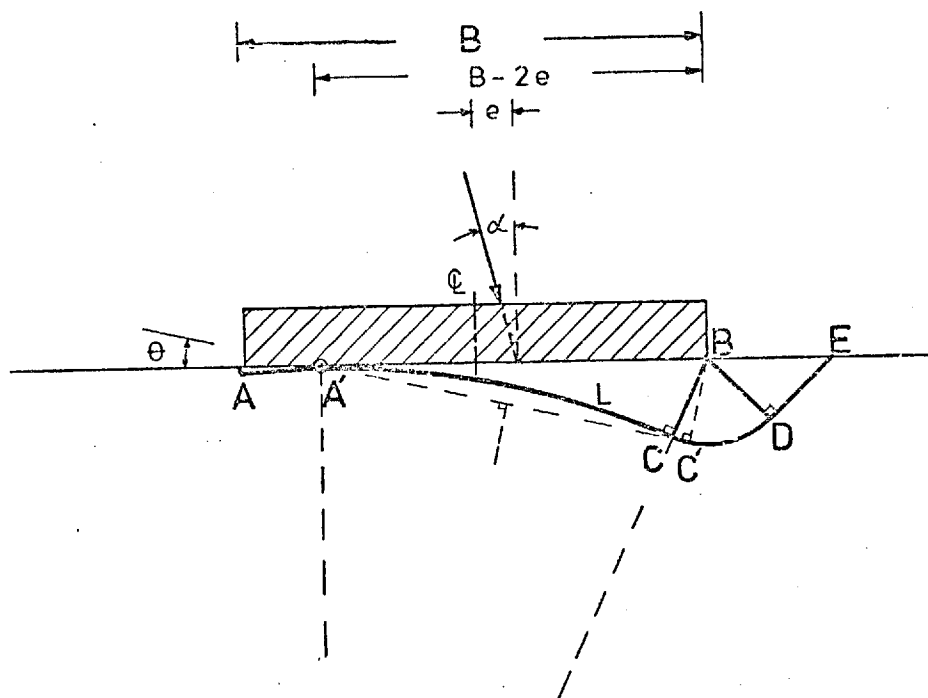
Failure of footing with inclined and eccentric load, after Vaughan et. al.(1976).
